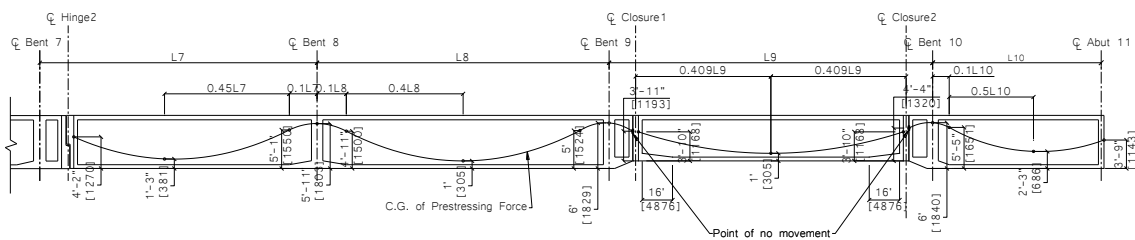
Prestressing tendons profile of Frame 3, Bridge 5EB
